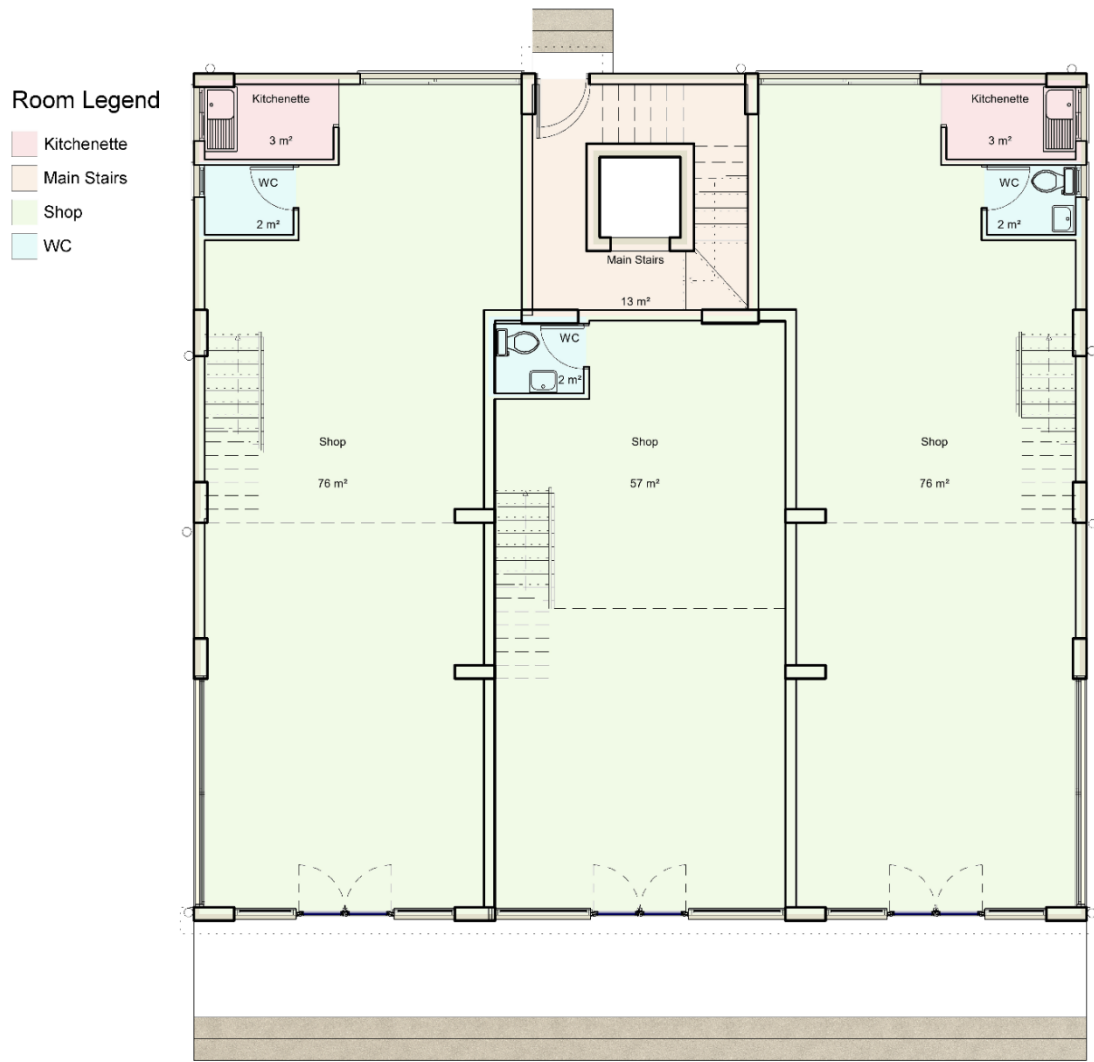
Ground Floor Plan of Cihangir residential building on level +0.45
